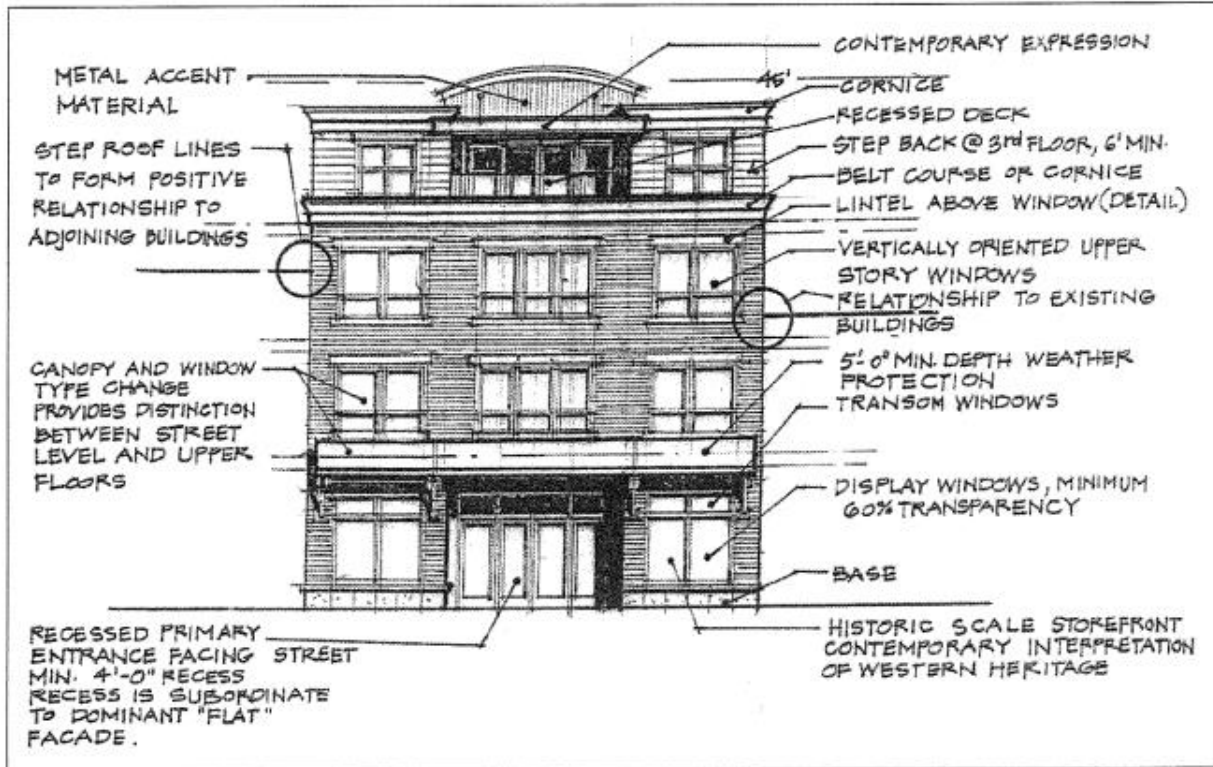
Example of acceptable building elements (applicable to single- or multi-story buildings).
